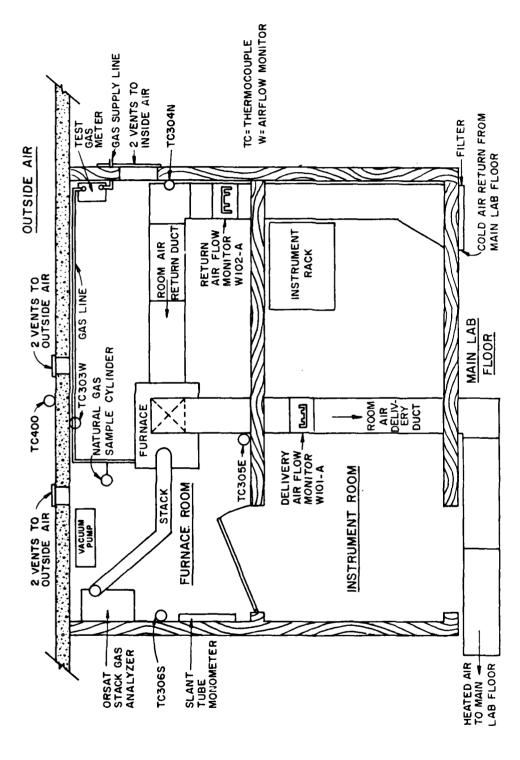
Floor Plan of Instrument and Furnace Rooms.
